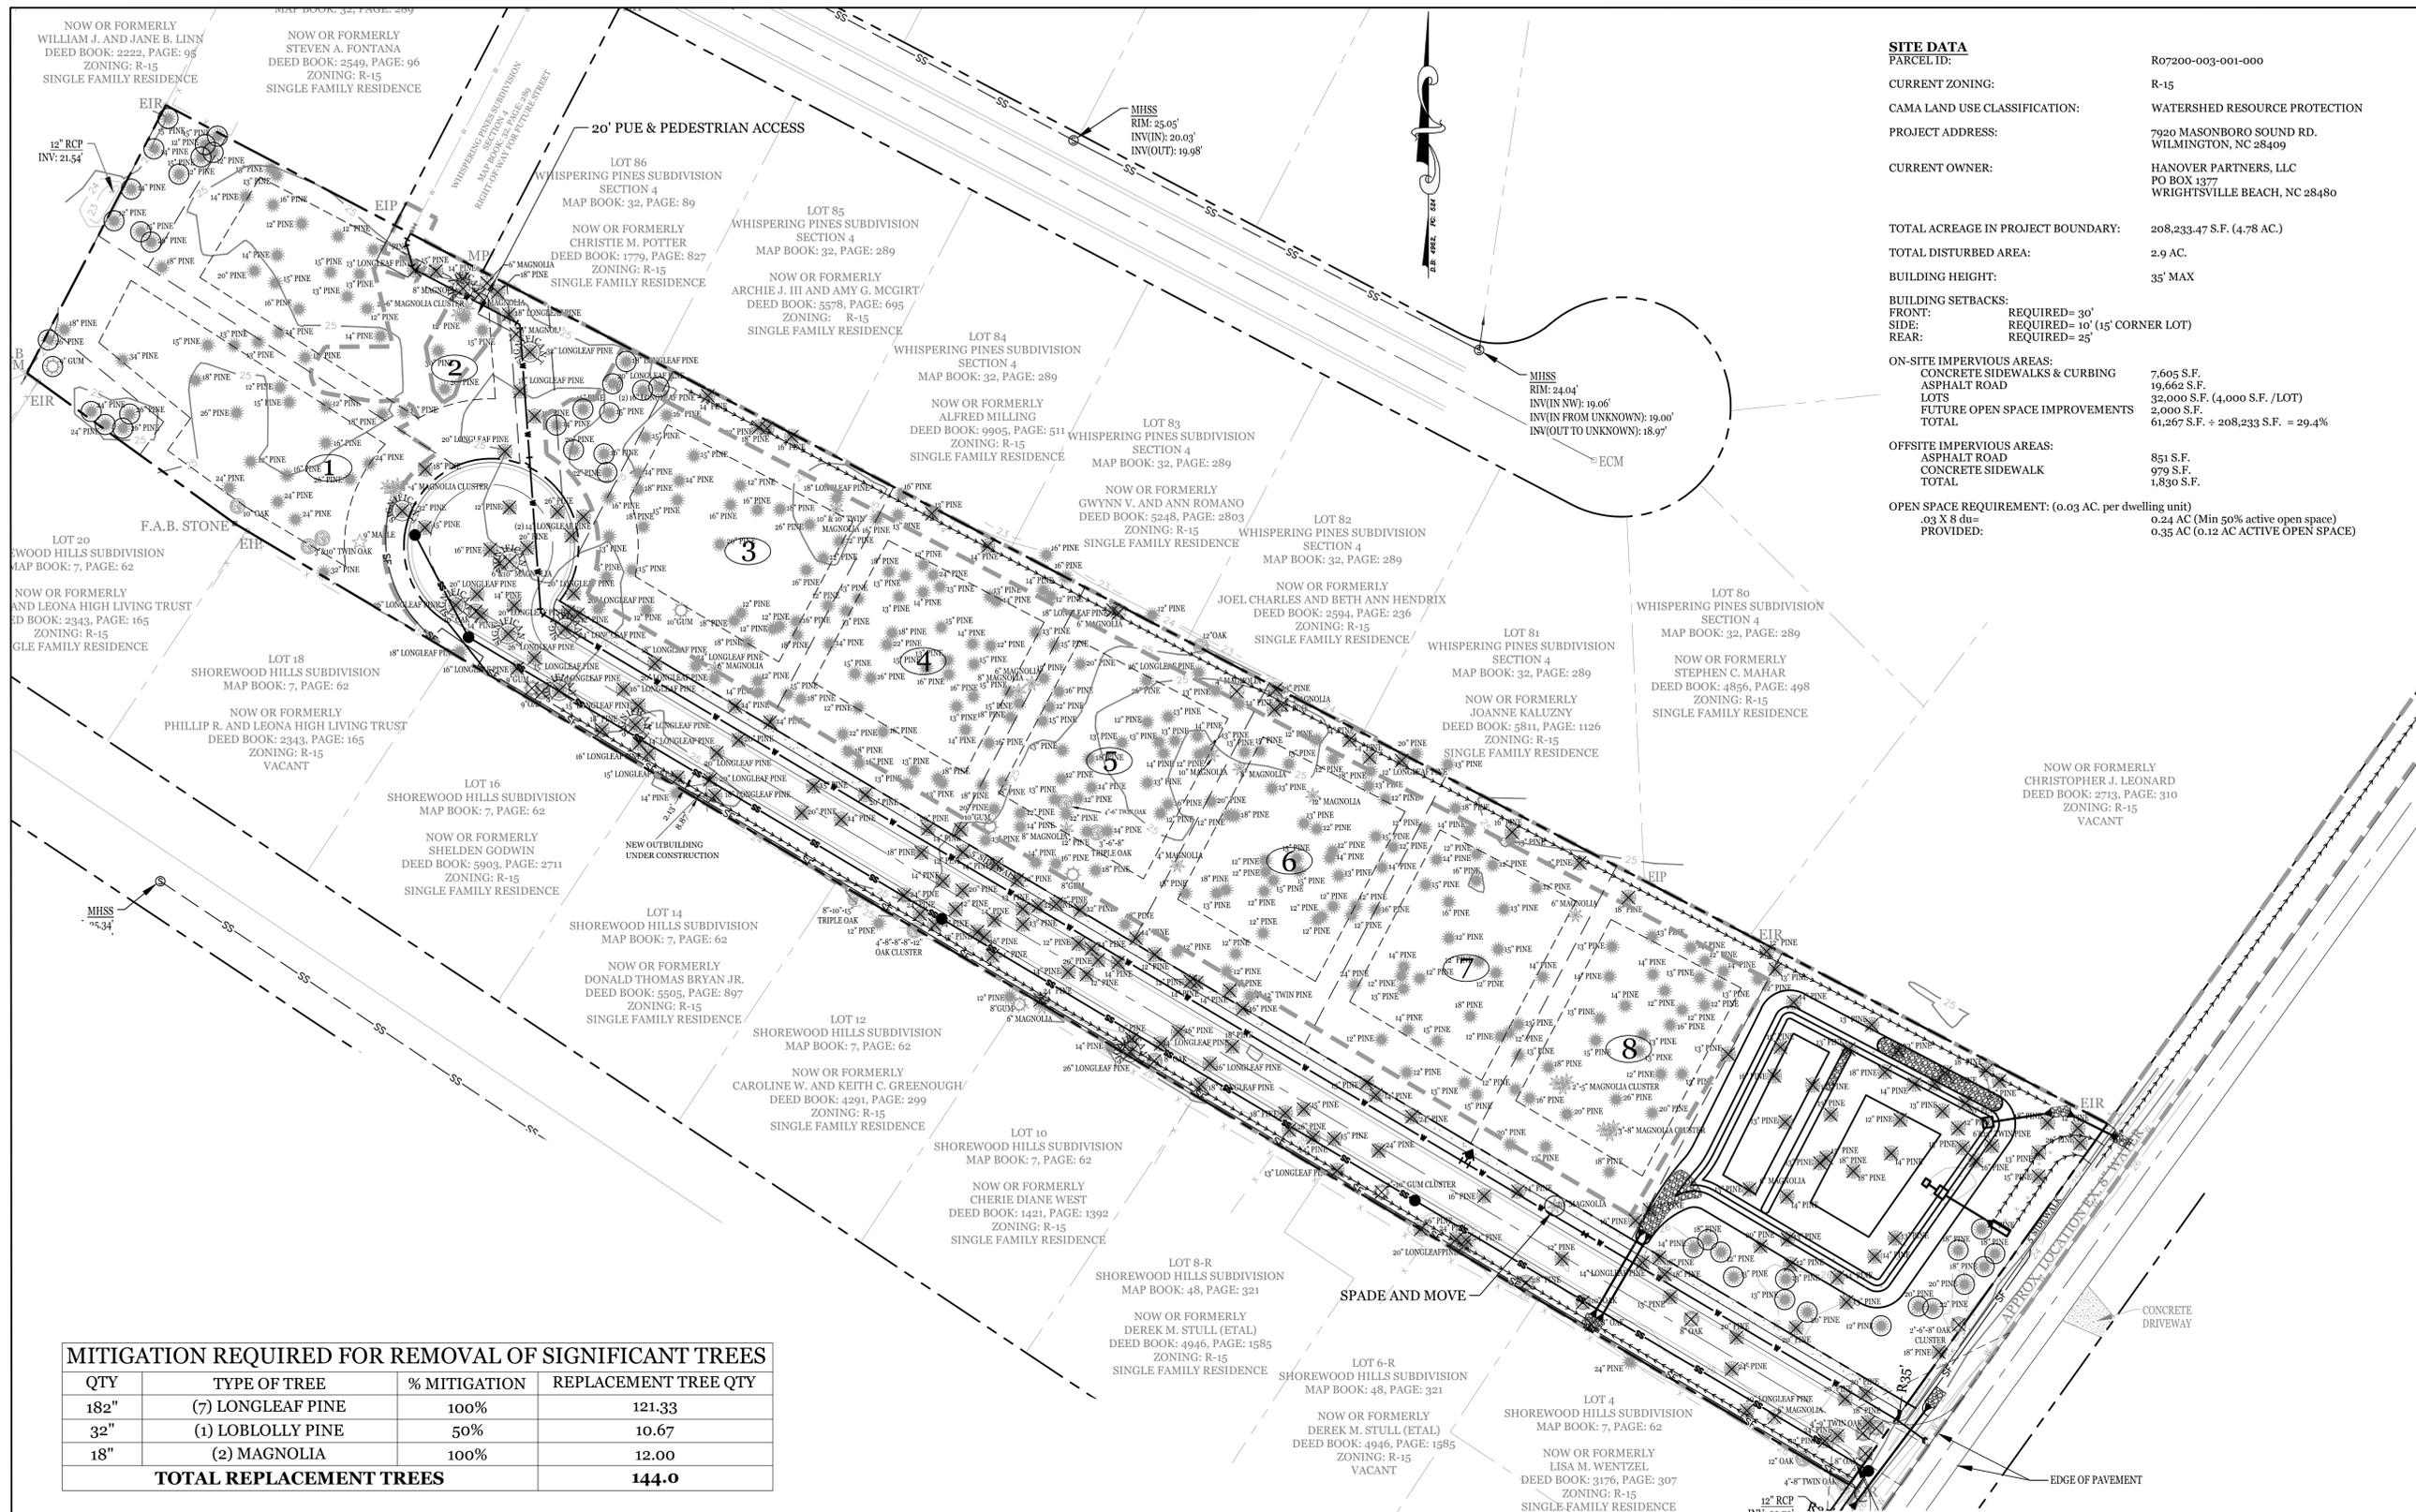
DETAILS FOR MASONBORO TRACE WILMINGTON, NC
